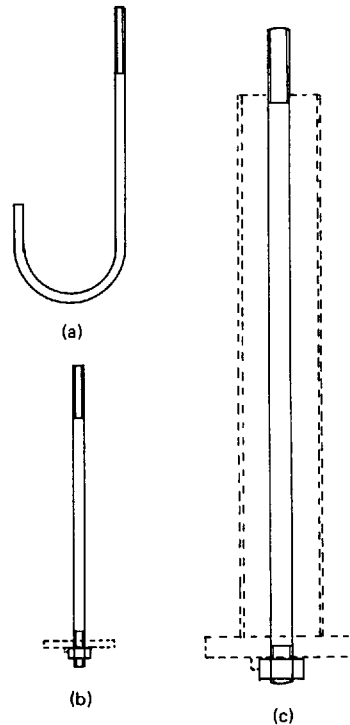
Cast-in-place holding-down bolts. (a) J-bolt; (b) washer plate bolt for light construction; (c) tubed bolt for heavy construction
